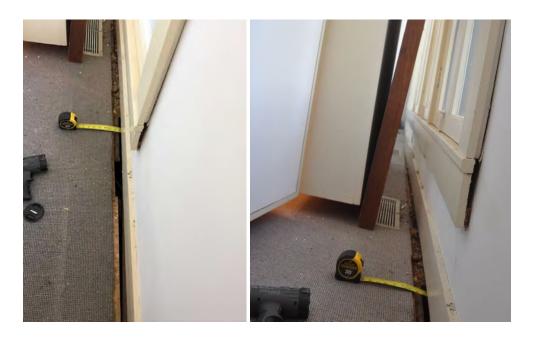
Cameron House Interior (2-3 inch gap in the first-floor decking)
